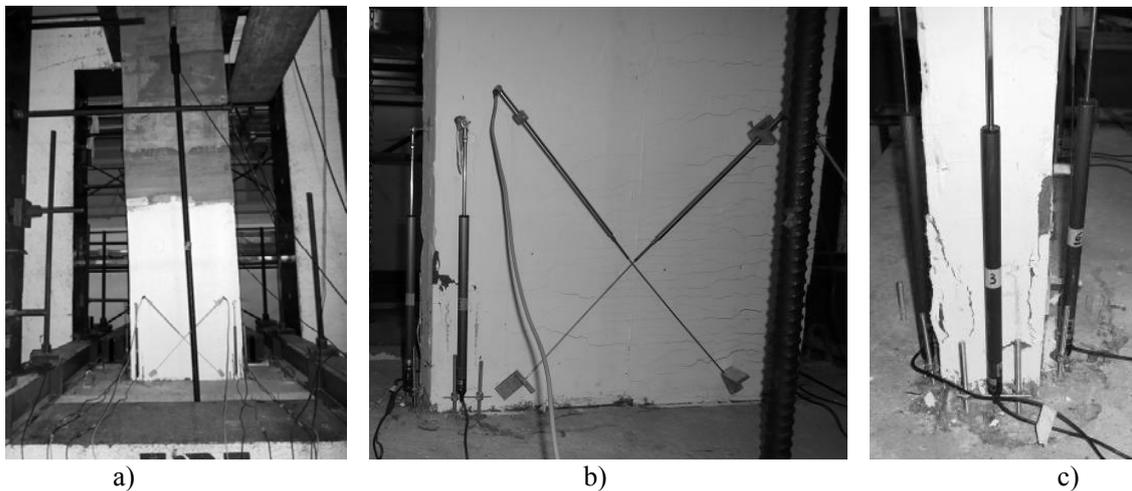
a) Side view of the deformed shear wall at collapse; b) detail of the crack pattern in the critical zone; c) collapse induced by the crushing of the jacket.
